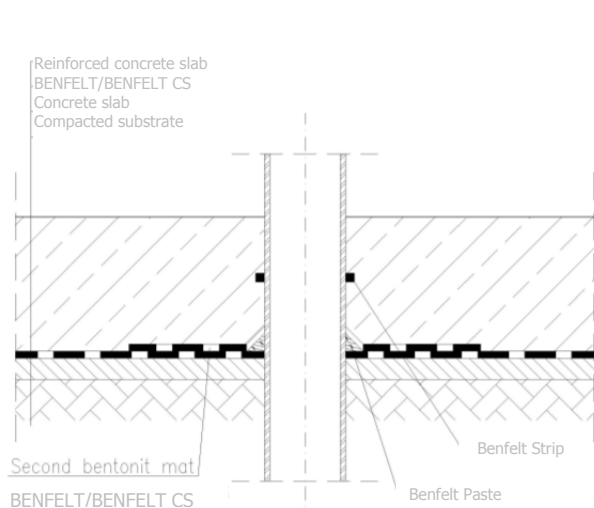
Sealing of the installation pipe penetration through the foundation board.
